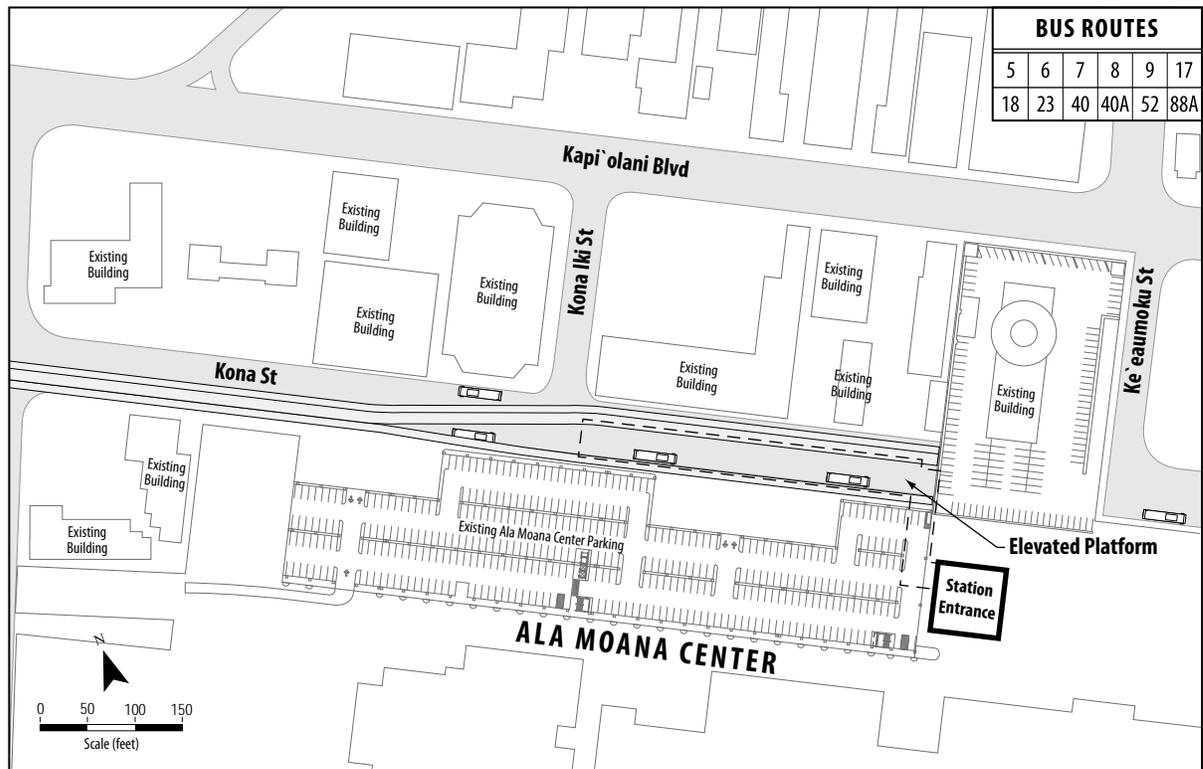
Ala Moana Center Station (All Build Alternatives)
